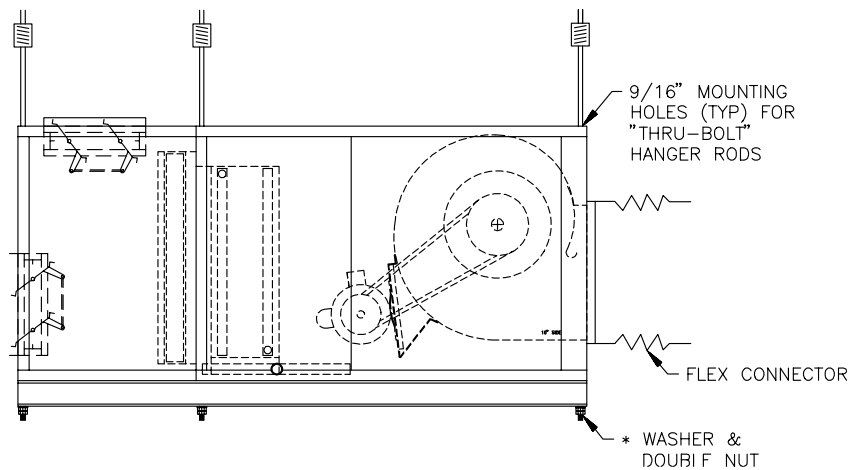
TYPICAL UNITS WITH FACTORY INSTALLED BASE RAIL. SUSPENSION WILL STILL BE THROUGH UNIT HOLES PROVIDED.
